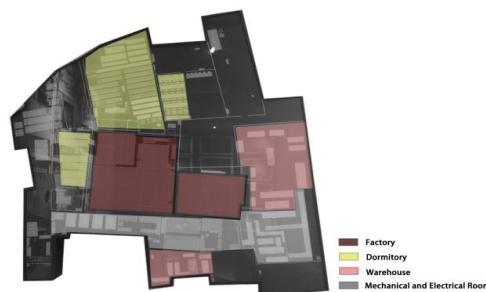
Initial construction floor plan of Xi'an Dahua Yarn Factory (drawn based on materials)
